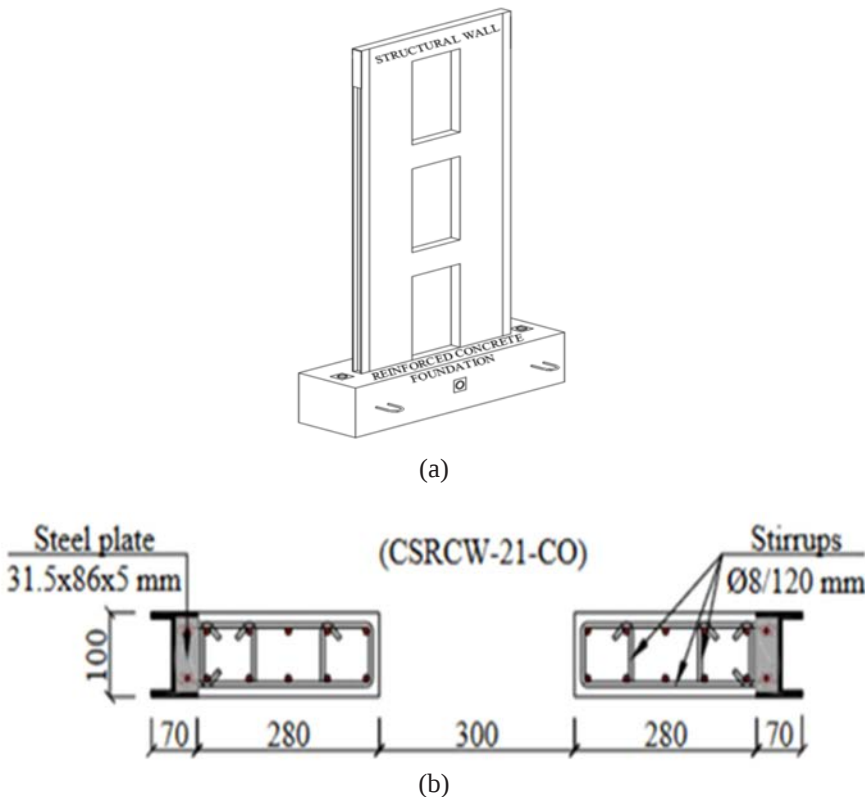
(a) CSRCW perspective view; and (b) Horizontal cross-section view (previously published).
